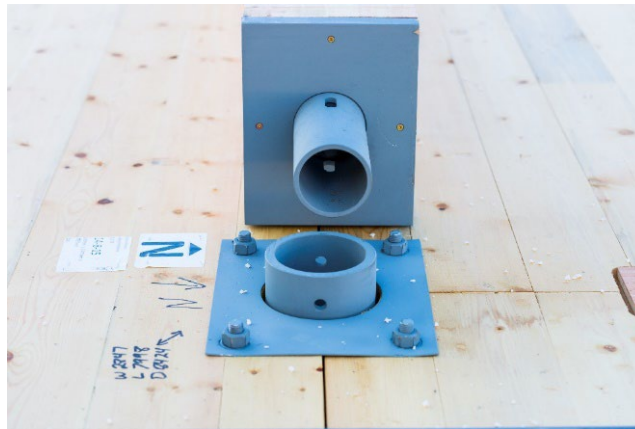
Column splice connection, UBC, Brock Commons (courtesy of www.naturallywood.com).
